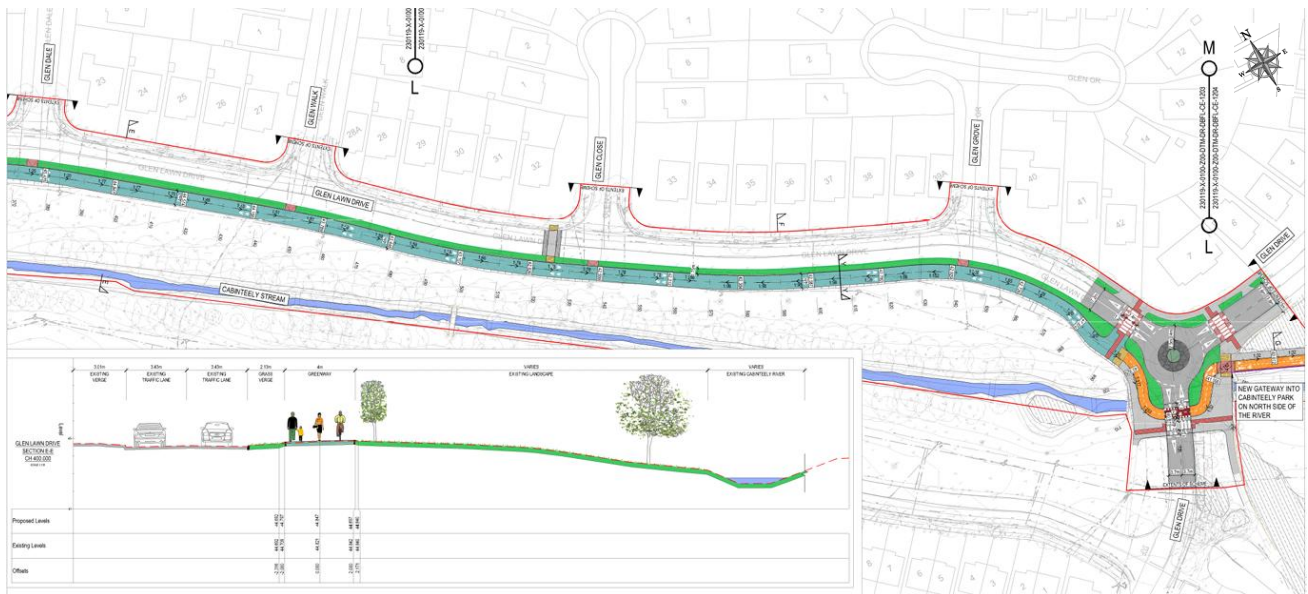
Proposed Section B(2) of Cabinteely Greenway (Source: DBFL Consulting Engineers)
